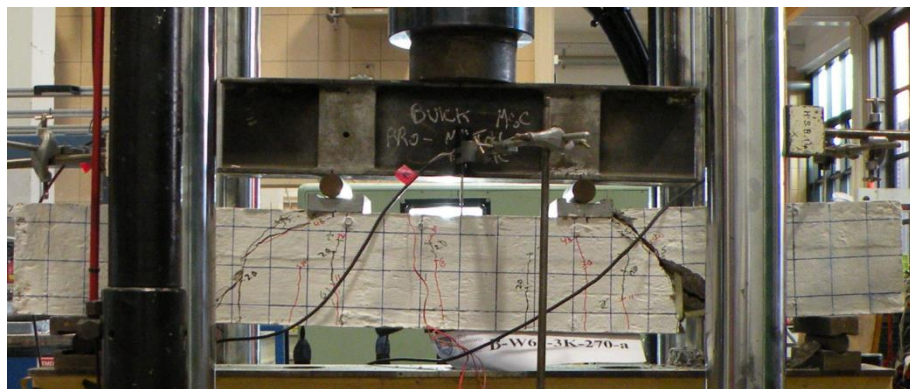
Crack pattern and failure mode of beam1 loaded and stored in conditioned in water at 60°C (B1-W-270d-3k).
